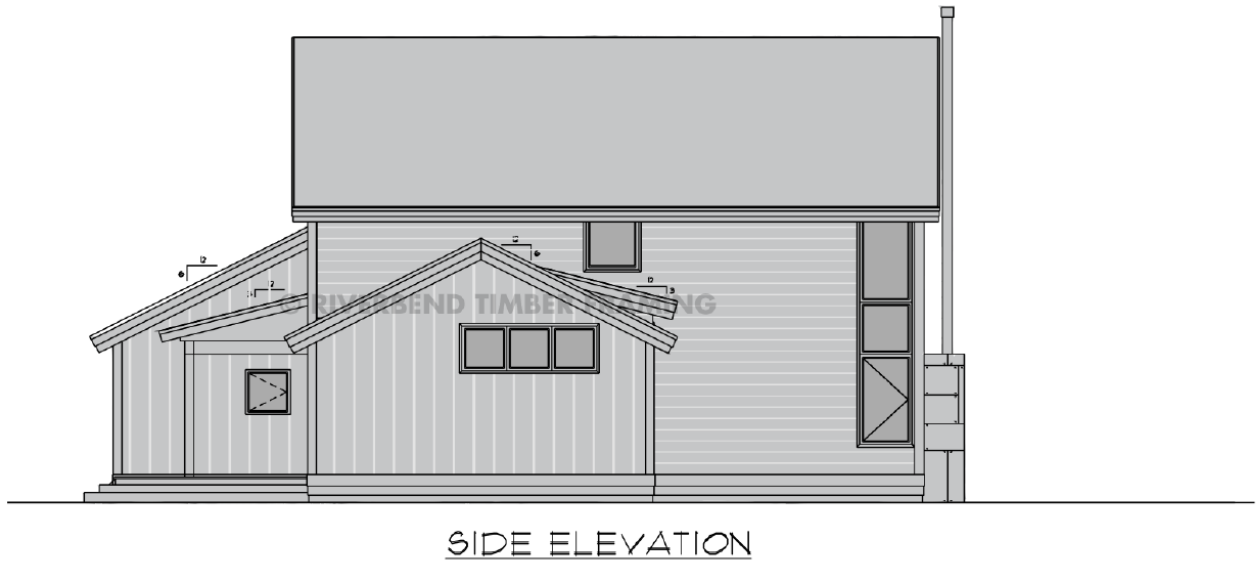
Side Elevation for Dwelling on Severed Lot (Source: Brauer Homes)
